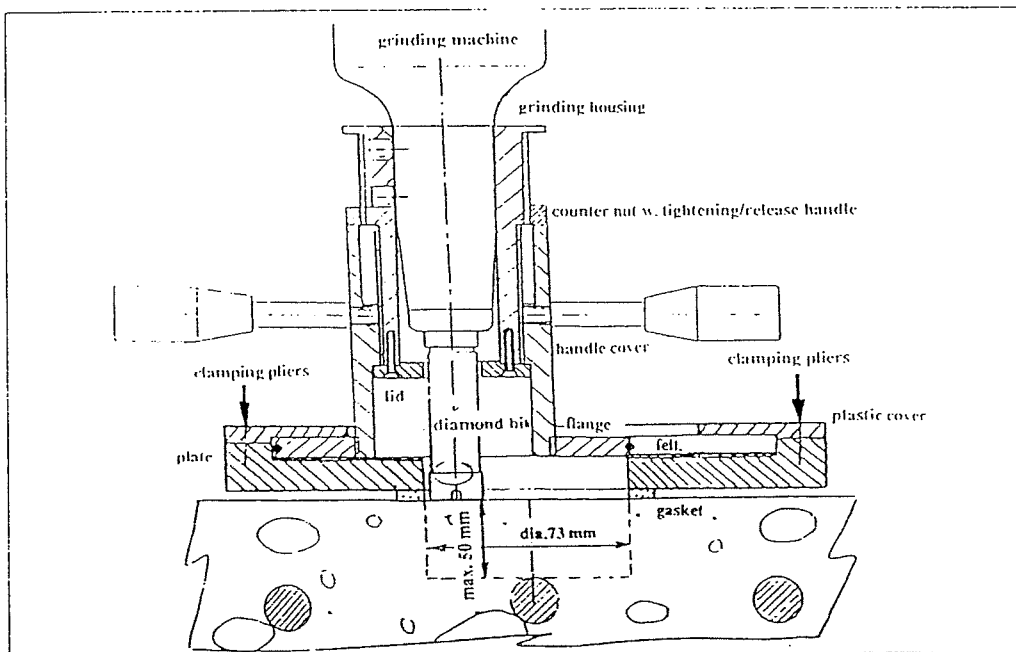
The PF-1100 Profile Grinder, Mark II, used in-situ for grinding out of dust on a horizontal surface.
